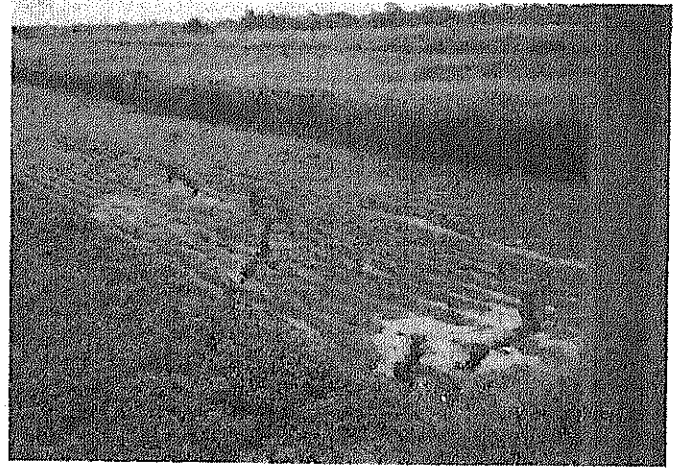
Crack on left bank down-stream side high riverbed
